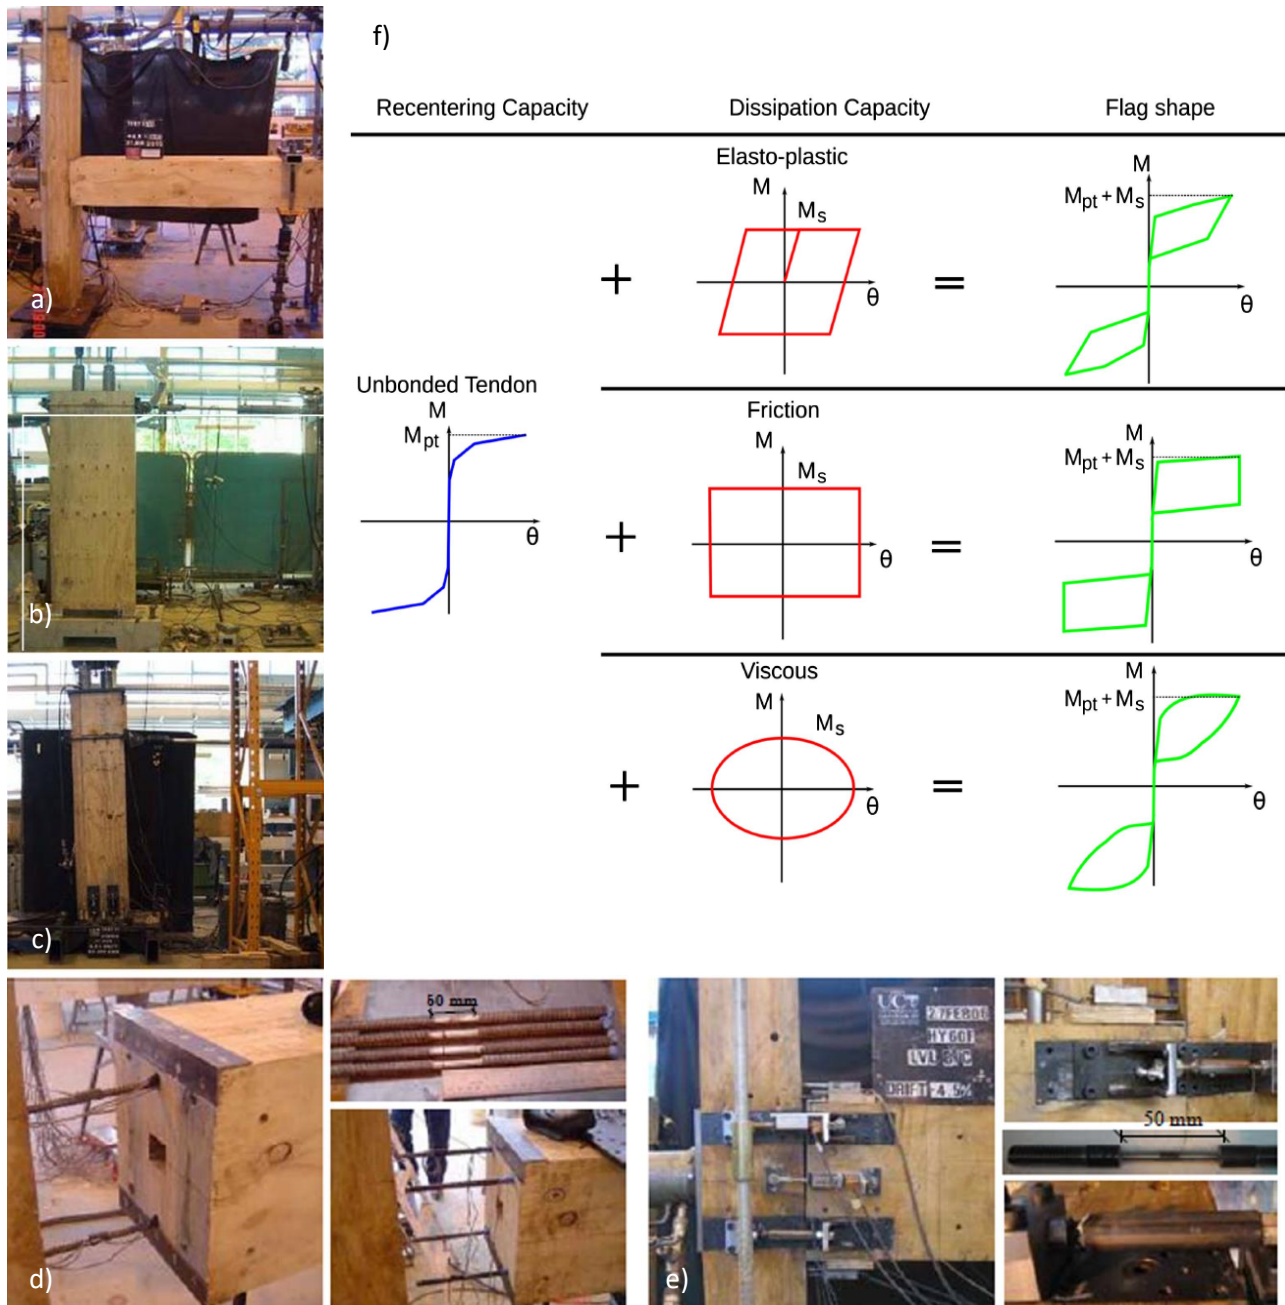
PT test setup of: a) outer beam-column joint; b) wall-to-foundation connection; c) column-to-foundation connection; d) internal dissipators; e) external dissipators; f) idealised flag-shaped response of a post-tensioned rocking connection – Source: [167, 168]
